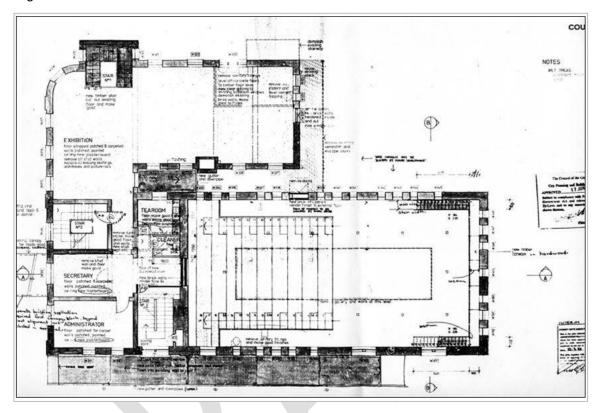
1982 First Floor plan, showing the proposed works to convert the sailor accommodation to the main auditorium and exhibition space in the northern, 1920s wing. (Source: City of Sydney Archives 539/1/82)
